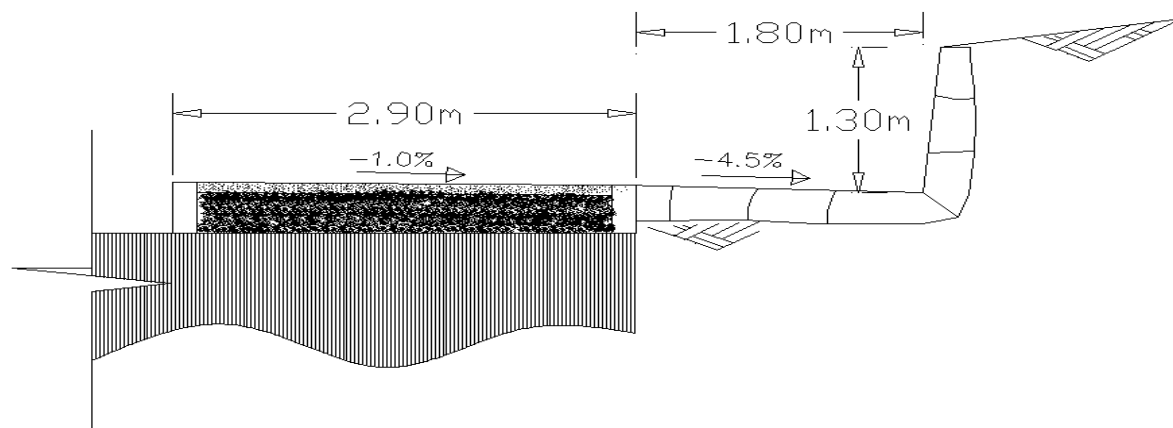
Typical Drainage and shoulders cross section at 0+094
